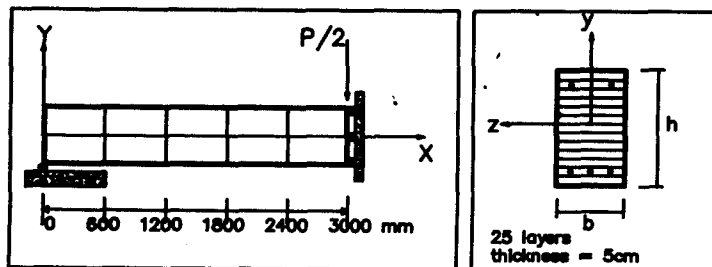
Loading Conditions and Layered Beam Section for Modeling
